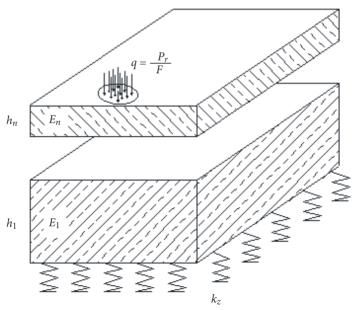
Pavement layer arrangement calculation diagram used in the numerical software
